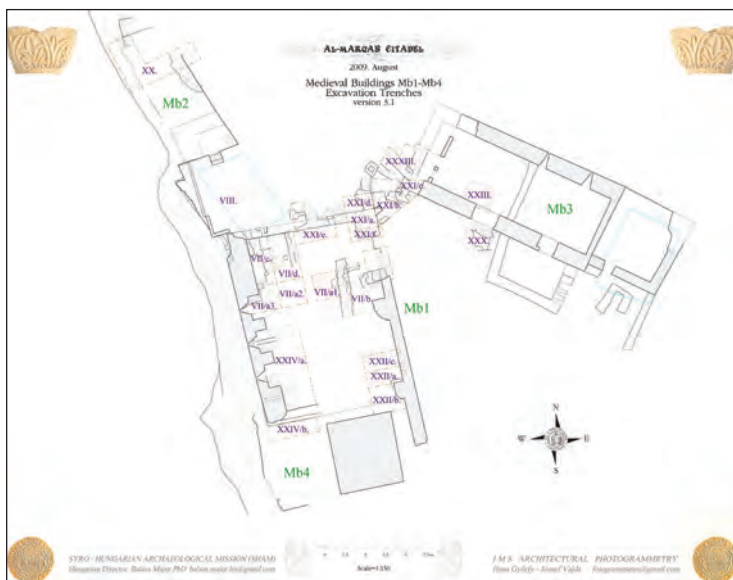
Photogrammetry plan of buildings MB1-4. (J. Vajda & I. Györfy)
